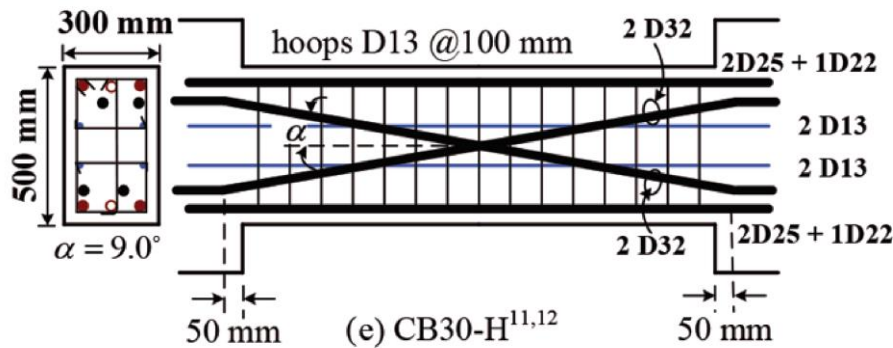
CB30H test specimen reinforcement configuration (Lim et al., 2016).
